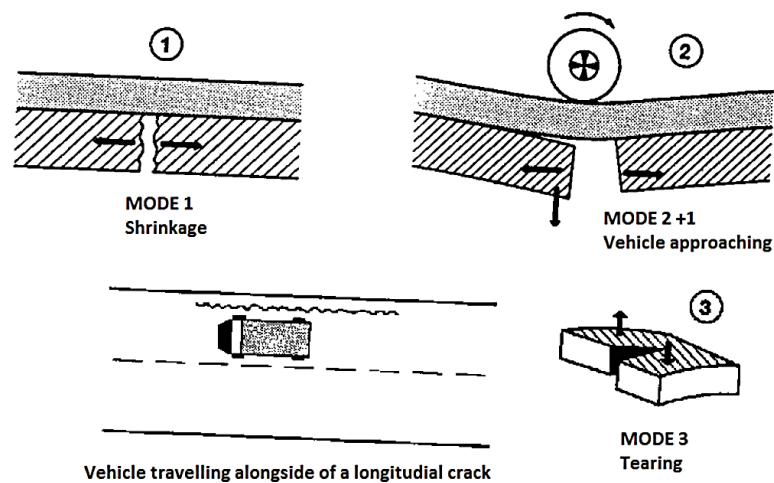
Three damage modes of a pavement, (Irwin, 1957)
